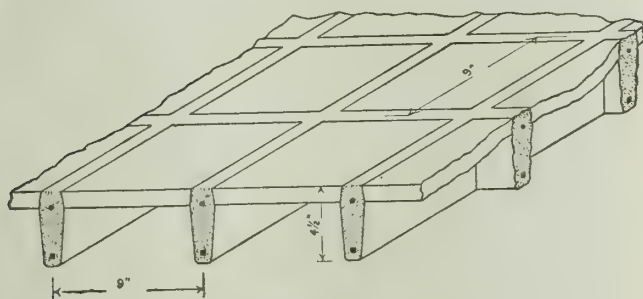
DETAIL OF "BRUNER" SKYLIGHT CONSTRUCTION
